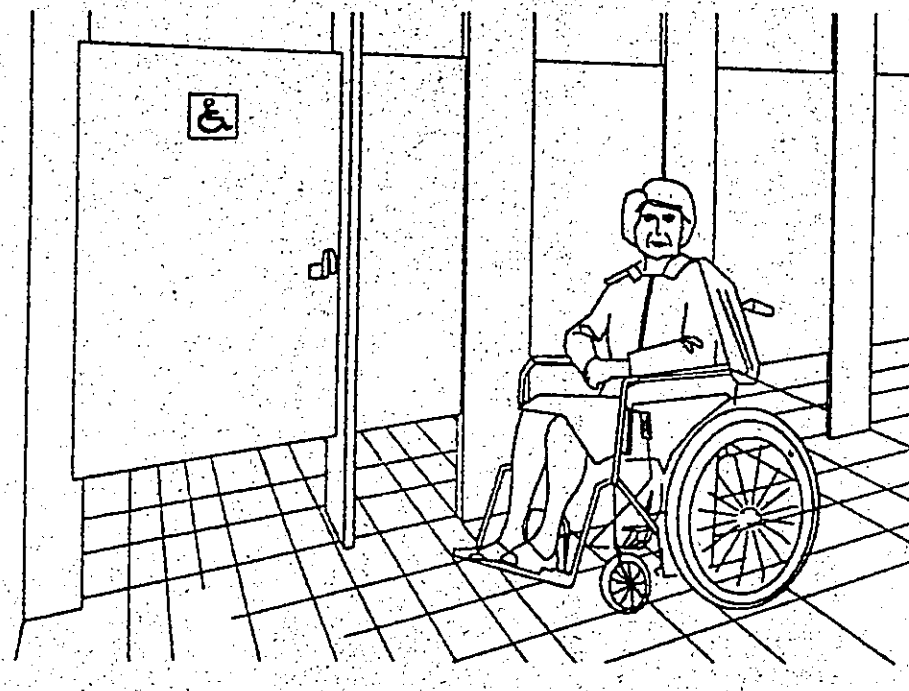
STANDARD ACCESSIBLE TOILET STALL (DOOR OPENING AT SIDE OF STALL)
